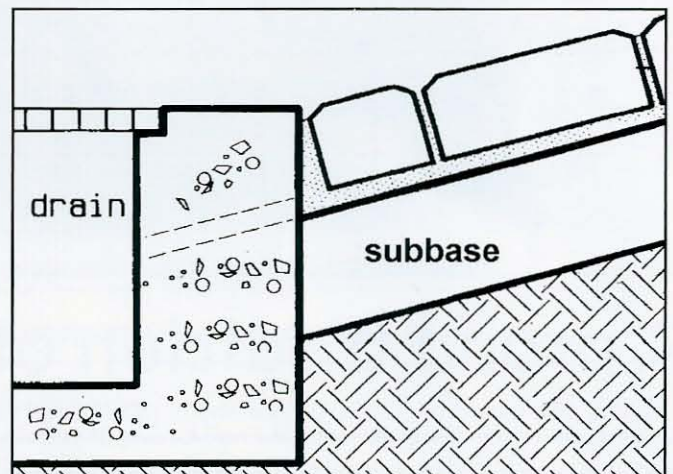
Details at manholes or drainage catchpit (CMA, 1998)
